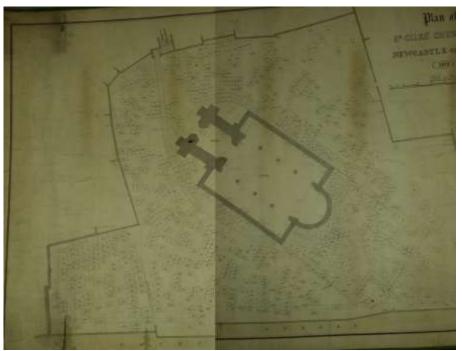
Original plan of the churchyard 1873, around the time of the rebuilding.
